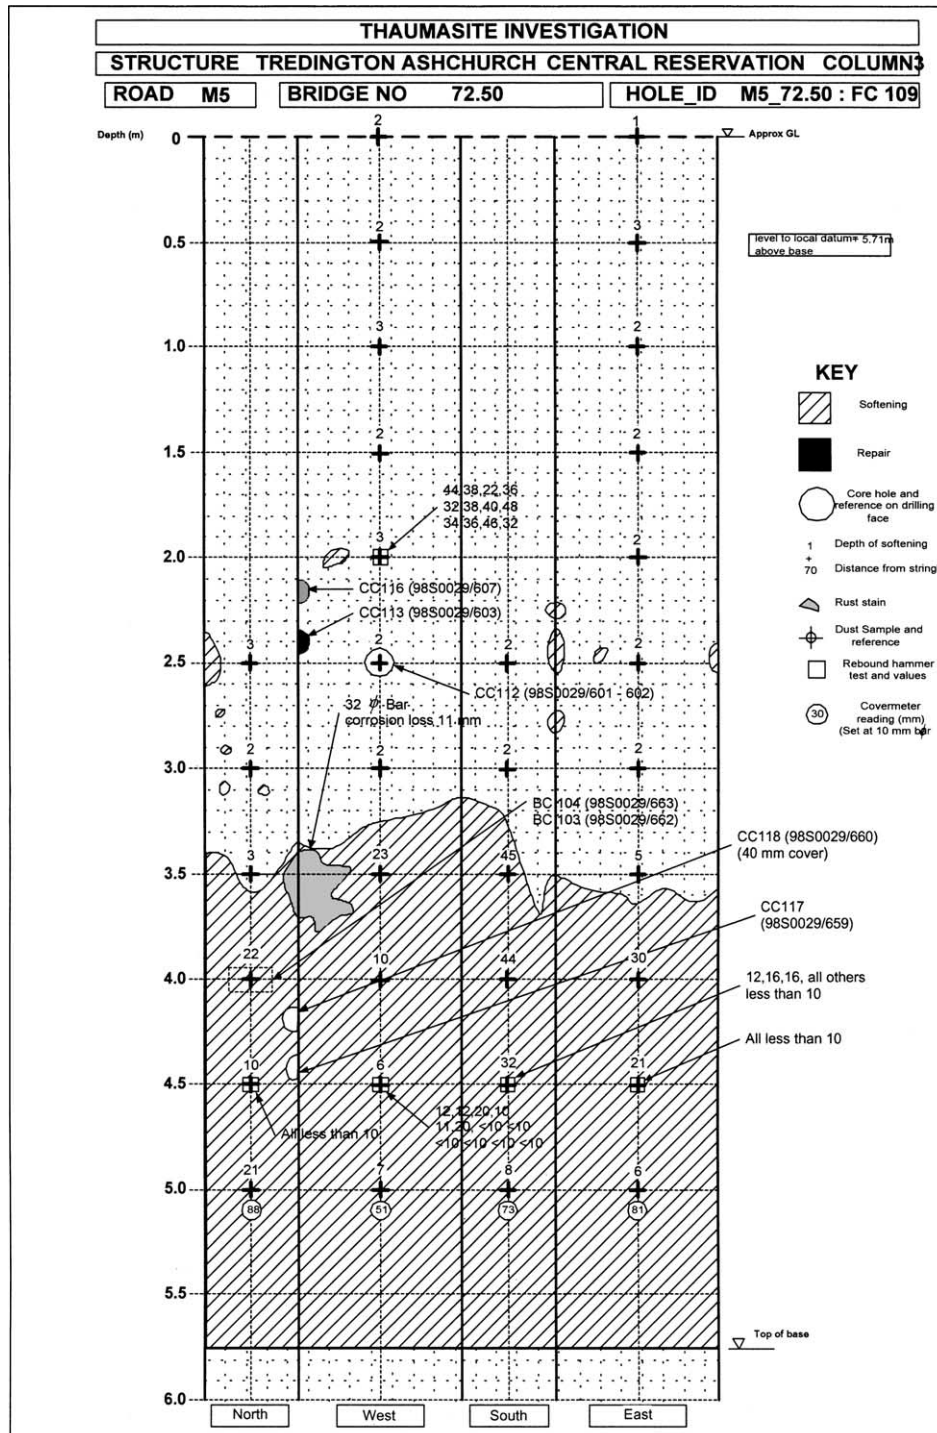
An example of a face log for mapping TSA at concrete structures.
